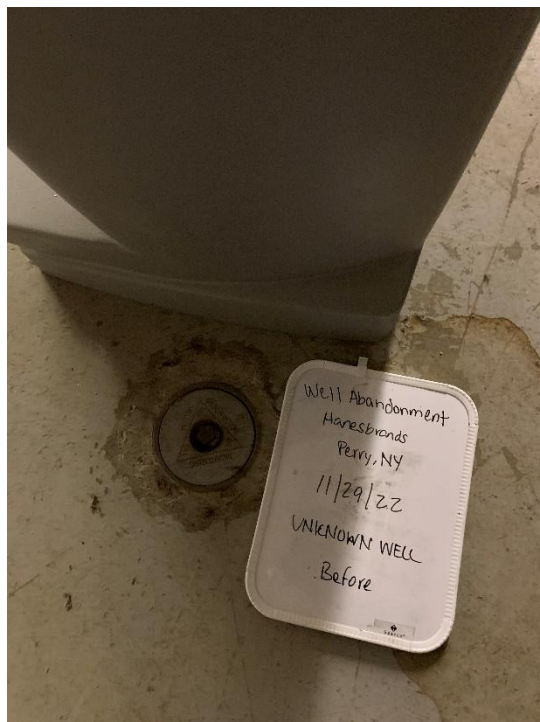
Previously Unknown Monitoring Well Prior to Decommissioning
